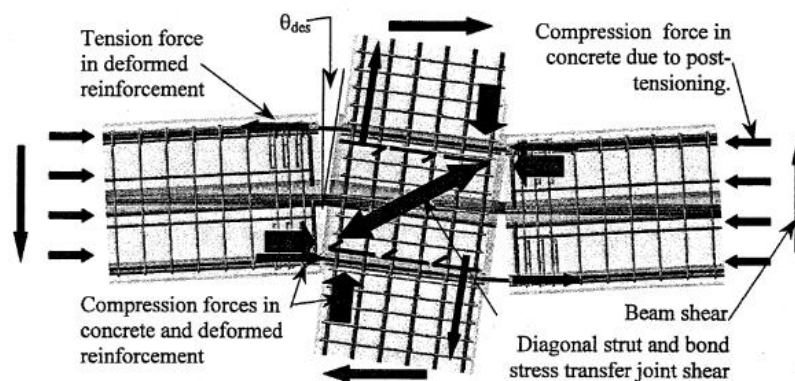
Unbonded post-tensioned joint forces at design drift [21]
